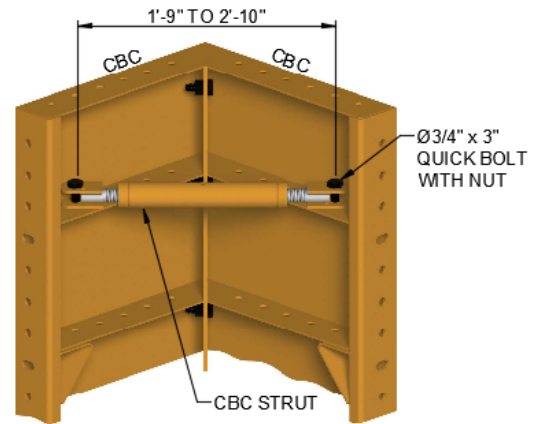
CBC Strut to Rib ConnectionTable 4b: HD Pipe Brace to Super Stud
